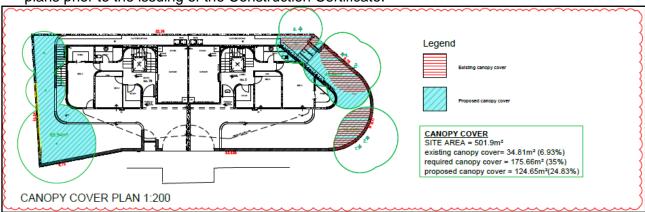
Amended Tree Canopy Calculations. Source: Amended Landscape Plans Rev A
